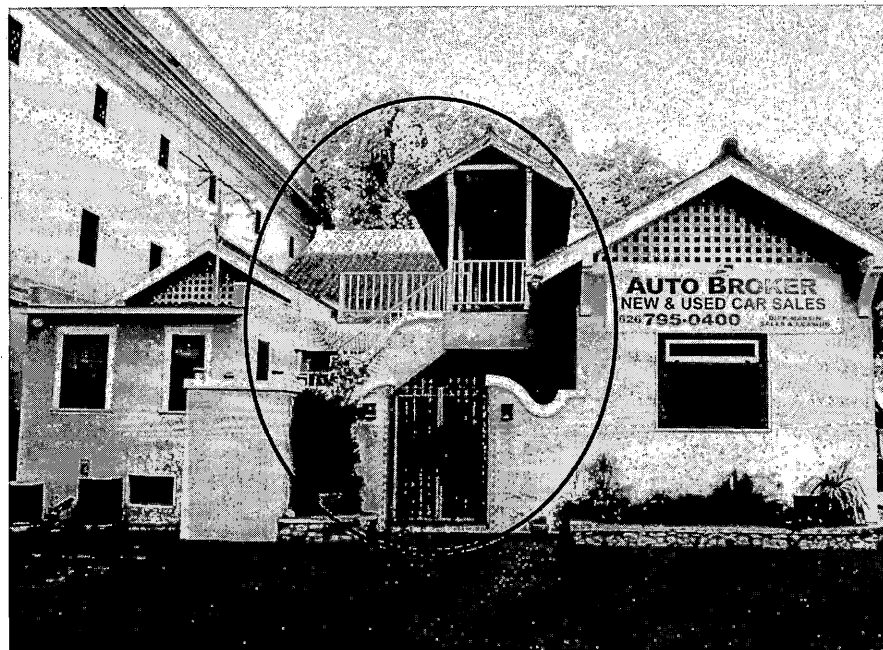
Looking west at the rear yard area showing the addition of stairs, upper porch and porch roof alteration.
